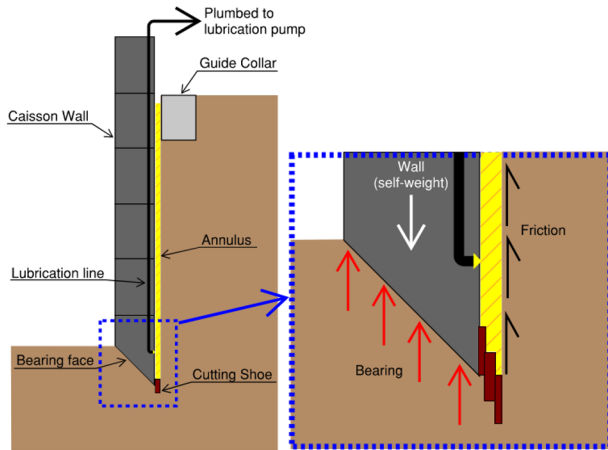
Section through caisson wall with notable elements labelled and zoomed-in details at base of structure.
